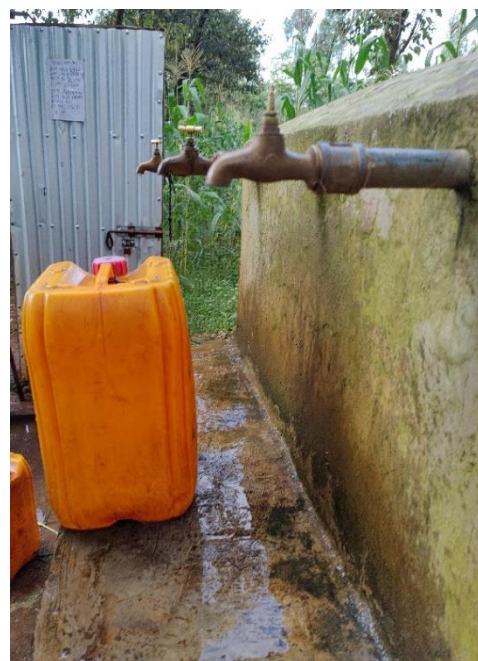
constructed water point, Bahir Dar, Plan, Ethiopia
